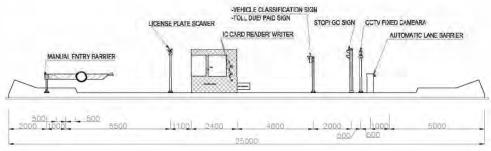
Installation of Roadside Equipment for Toll Collection
